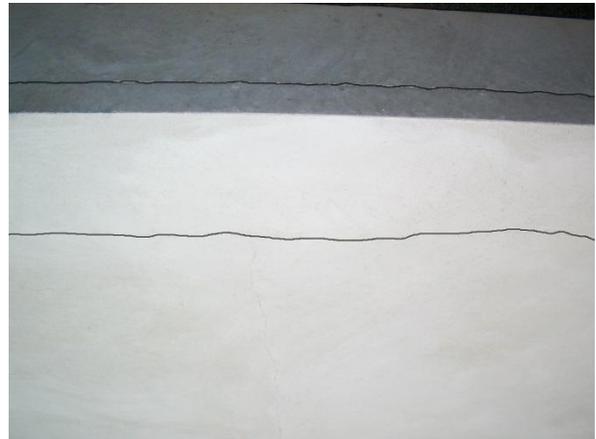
Crack developing at end of insulation and at top of panel (cracks highlighted for clarity)
